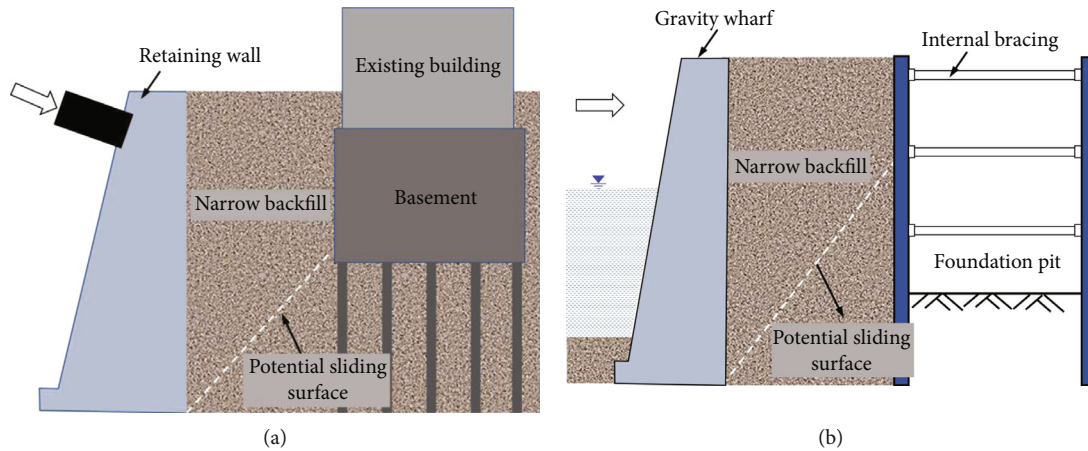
A schematic for narrow width backfill behind a retaining wall: (a) near an existing building; (b) near a foundation pit.
